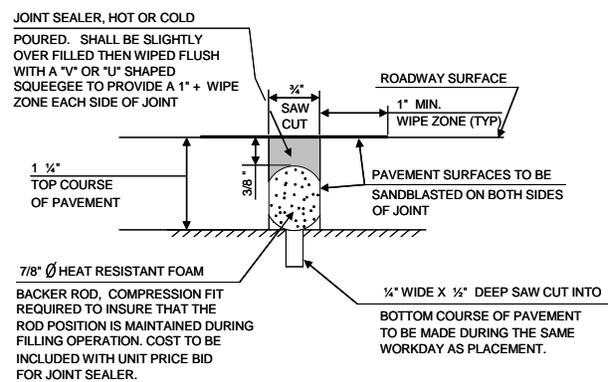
2 Saw Cut Joint Detail Close Up
